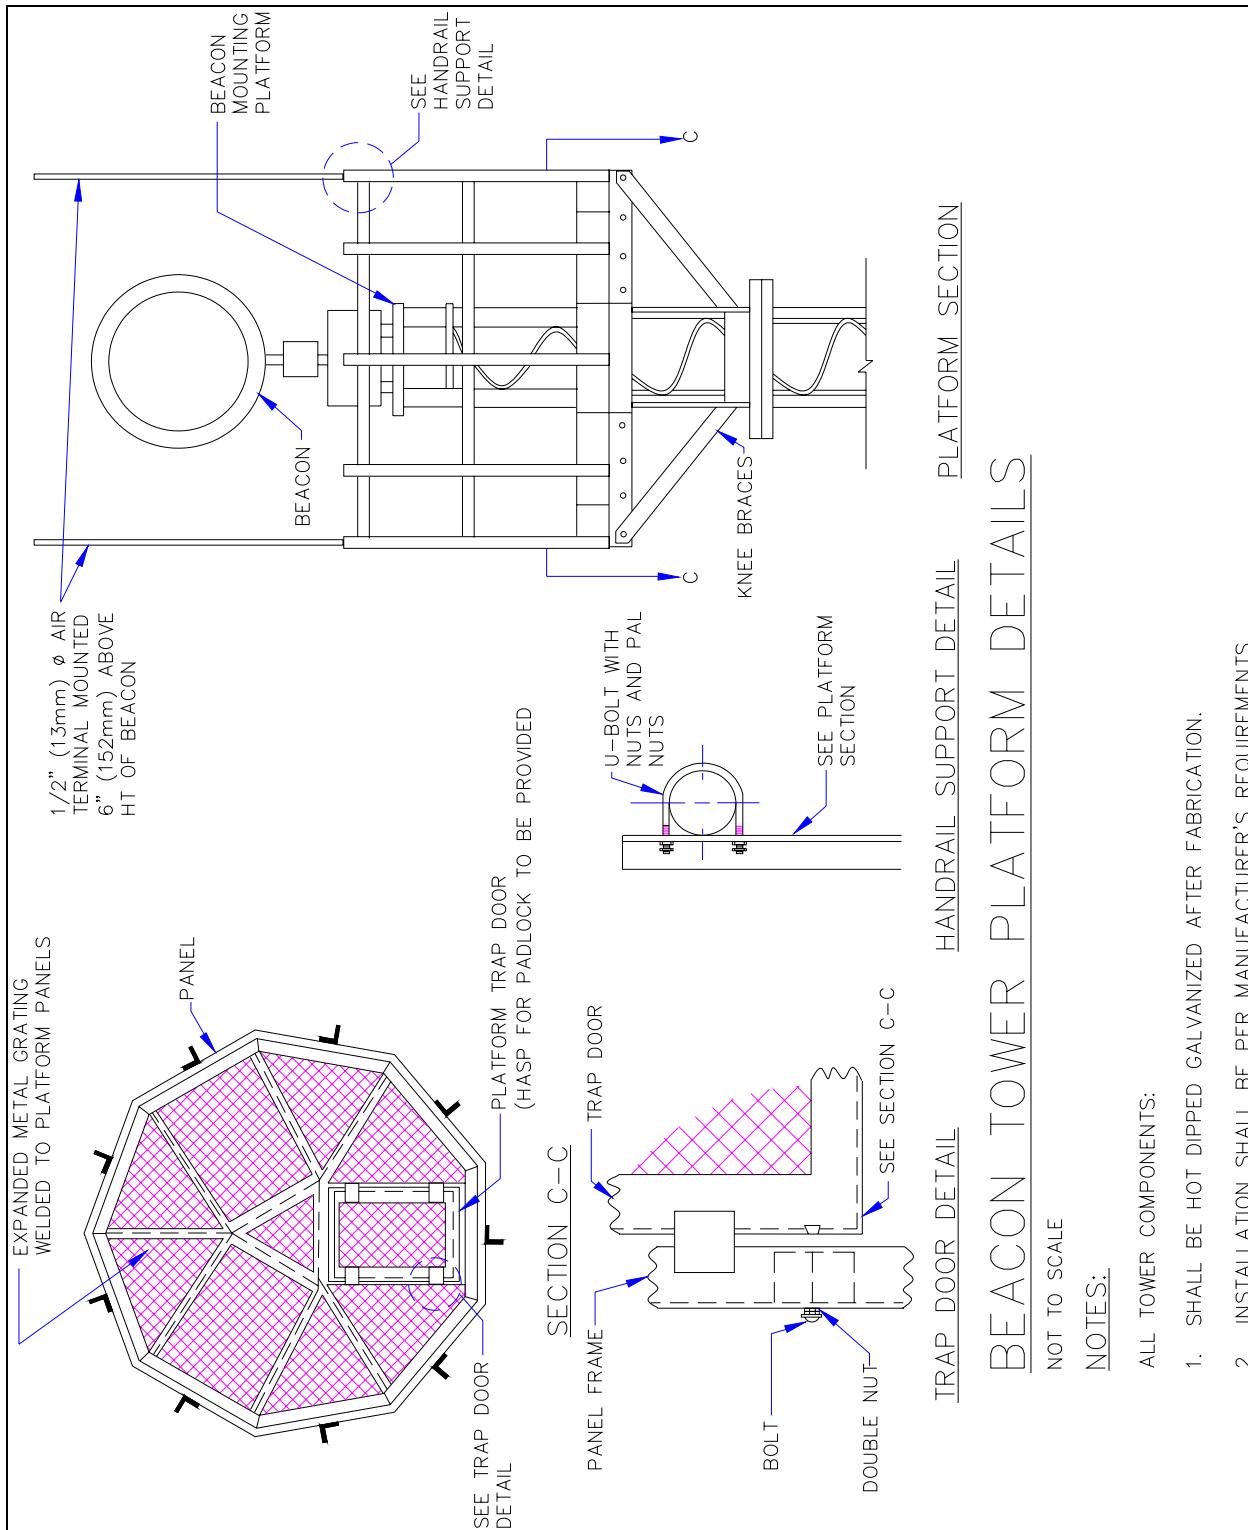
Typical Pre-fabricated Beacon Tower Structure
